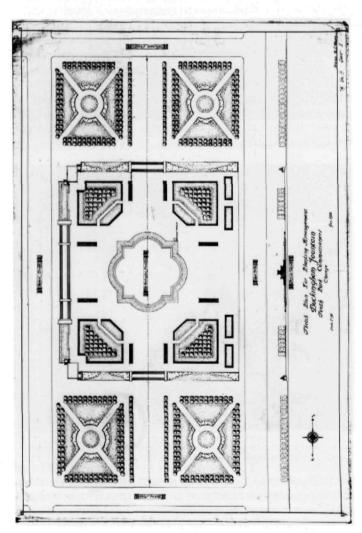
Sketch Plan for Planting Arrangement, Buckingham Fountain. South Park Commissioners, 1928. Courtesy CPDSC.
